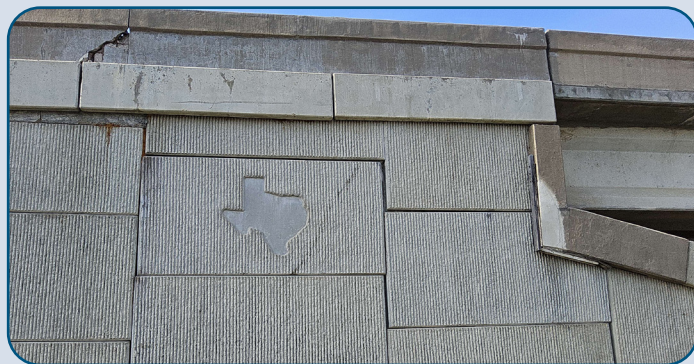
SRT NB MSE Wall Panel Racking at Paige/Plano Pkwy.
